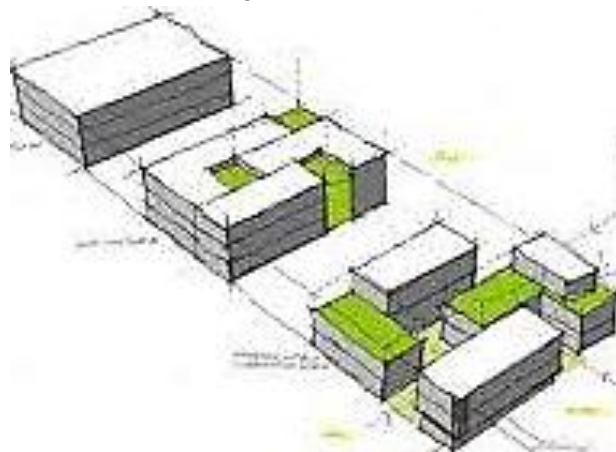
An alternative with a separate plan of residential blocks to plan the subject of the project
